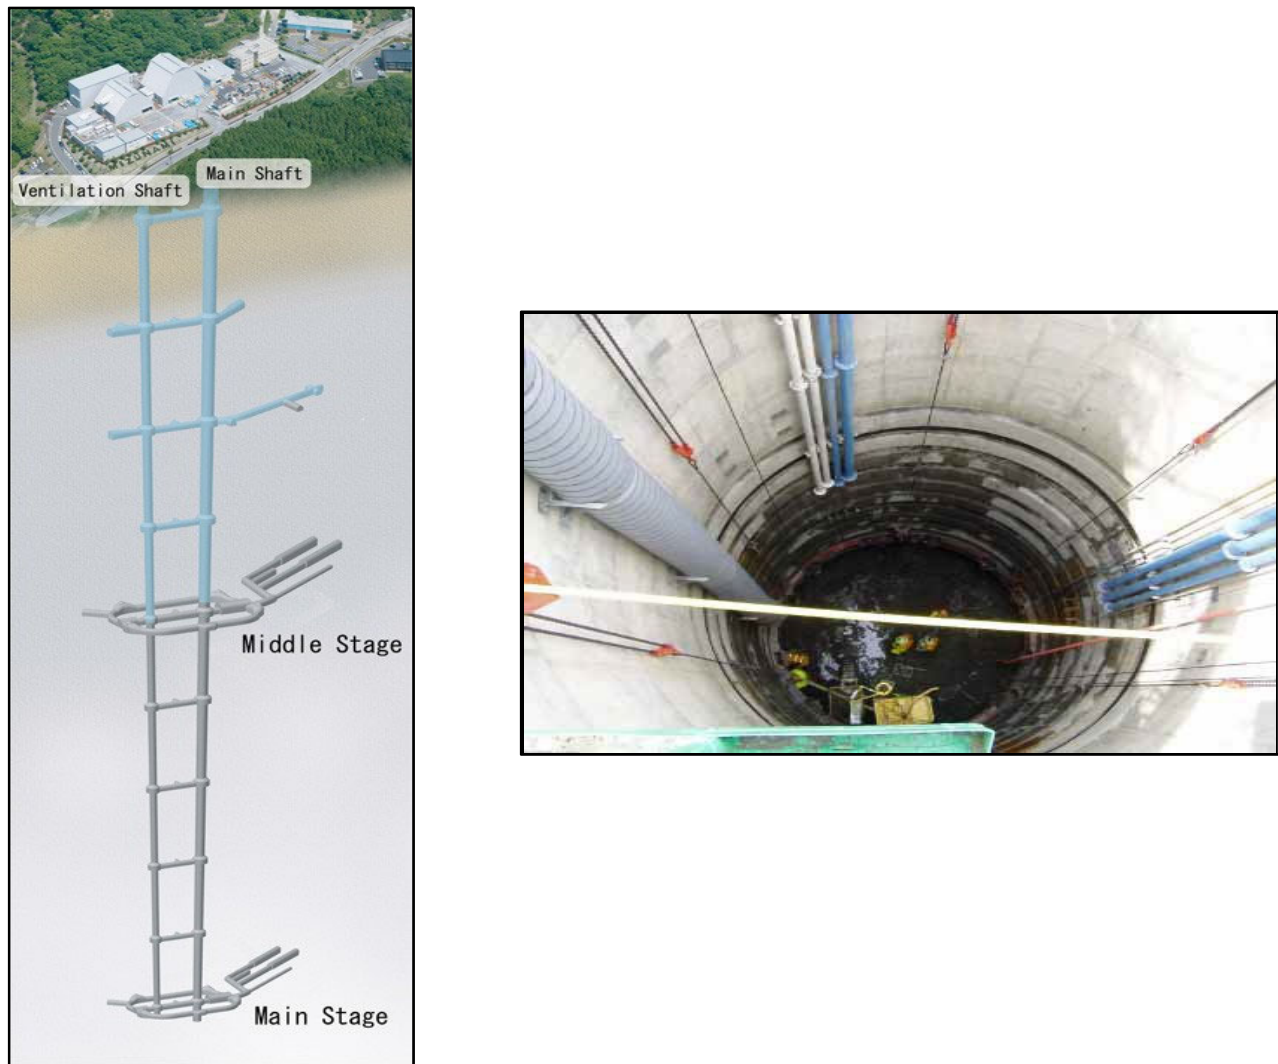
Layout of the Mizunami Underground Research Laboratory in Japan, and photo of tunnel shaft construction.
